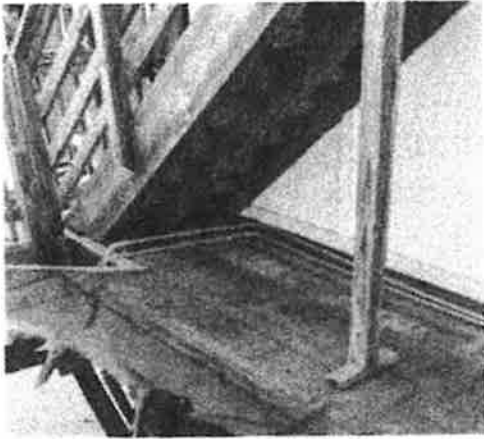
Add posts and beam at center of star stringer per drawings Also Add bracing to (2) existing posts supporting the third story deck per S1 of 1 drawing.
